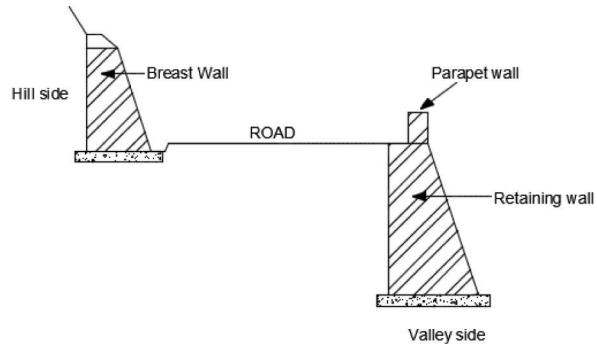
Breast wall, Retaining wall, Parapet wall
